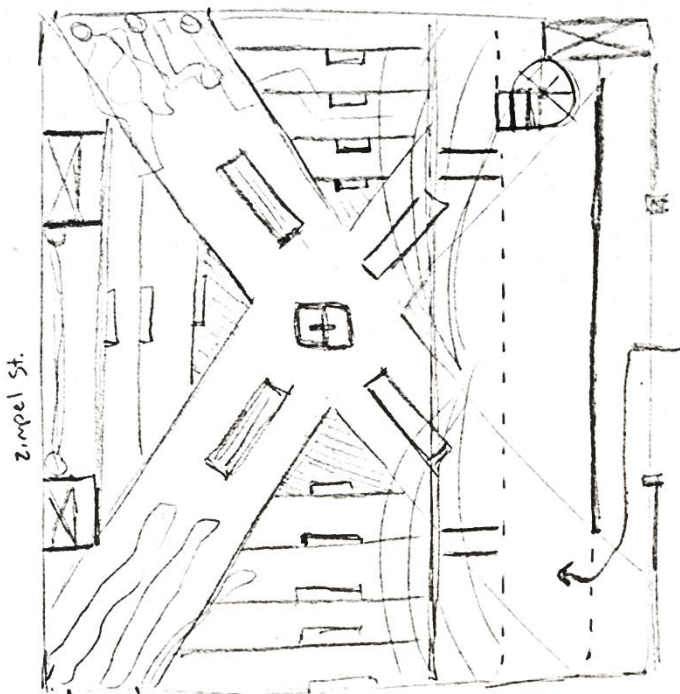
(Left): Conceptual ground plan sketch for intersecting alleys and crane rail access. 2021, Tulane University.
